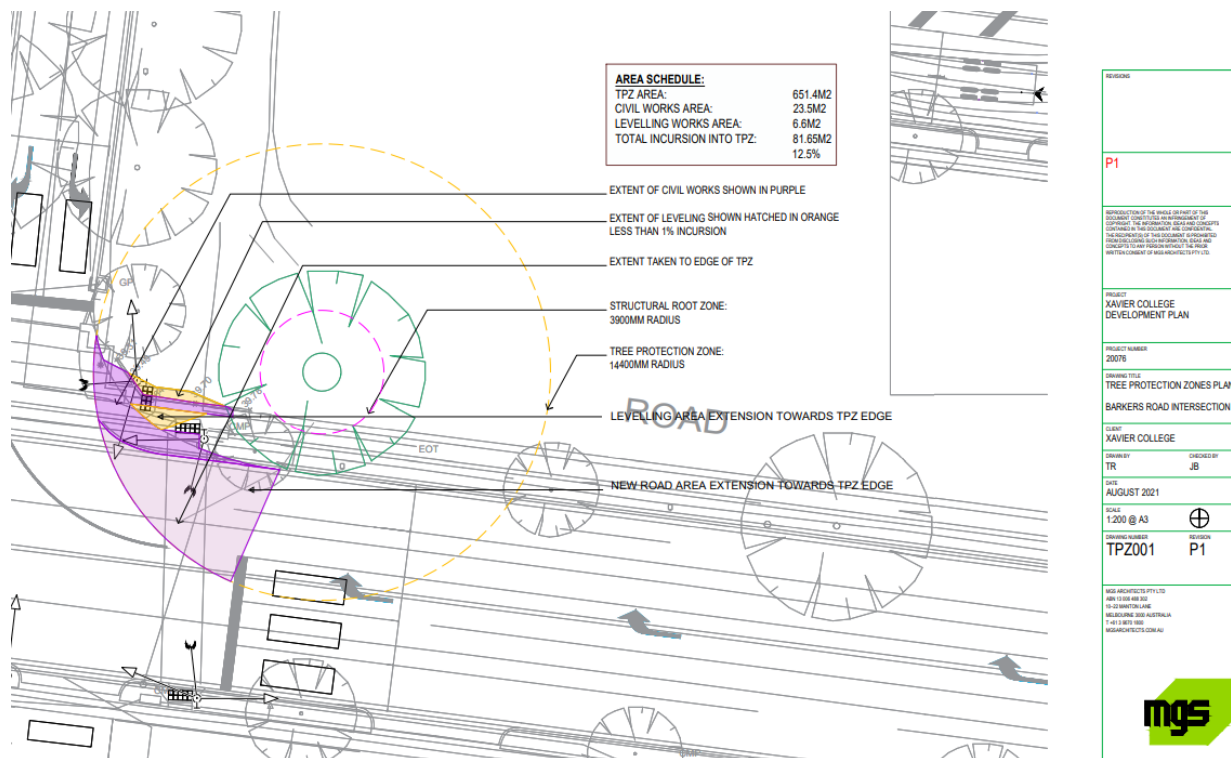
Excerpt from Barkers Road Intersection plan – TPZ001 P1. (Client, August 2021).
